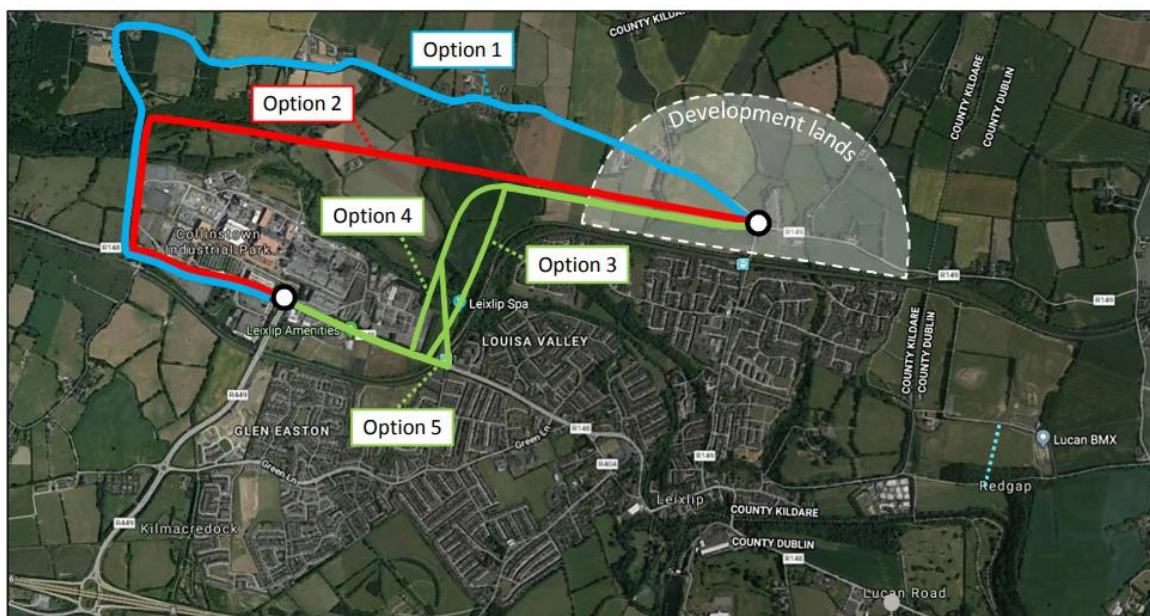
Western Route Road Options Considered (extract from AECOM Leixlip STA 2019)
